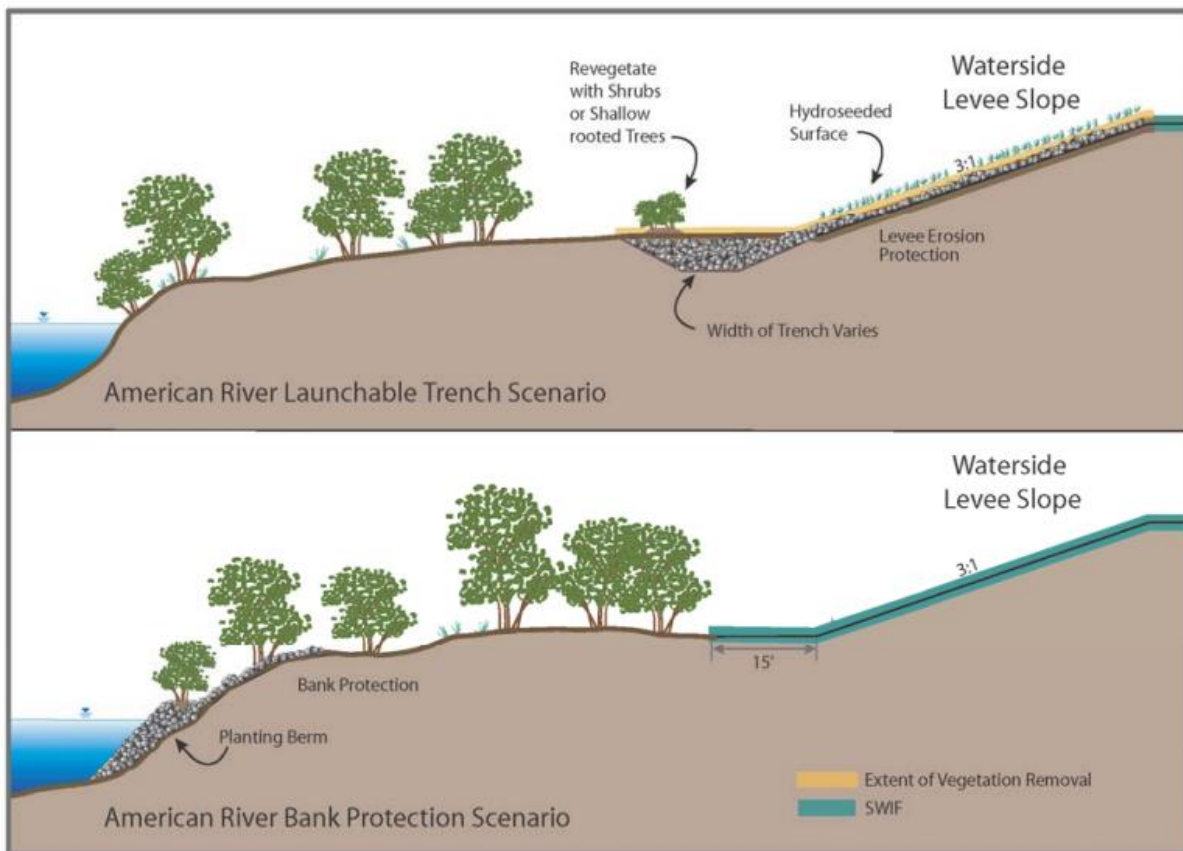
Bank Protection and Launchable Rock Trench Typical Design.
